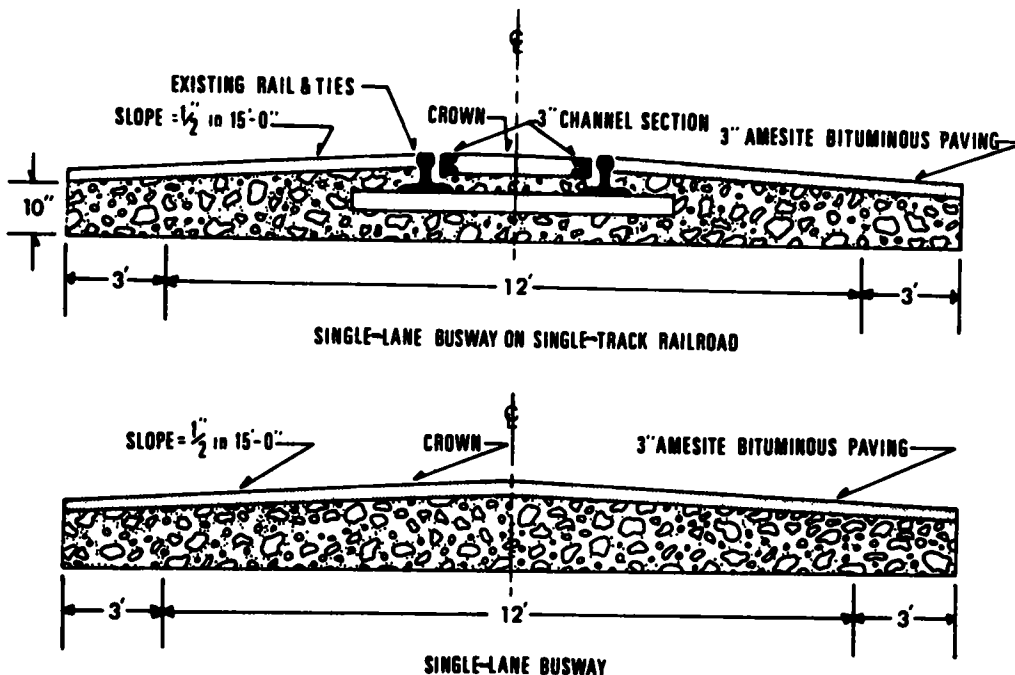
Alternative cross-section designs, Georgetown Busway, Washington, D.C
